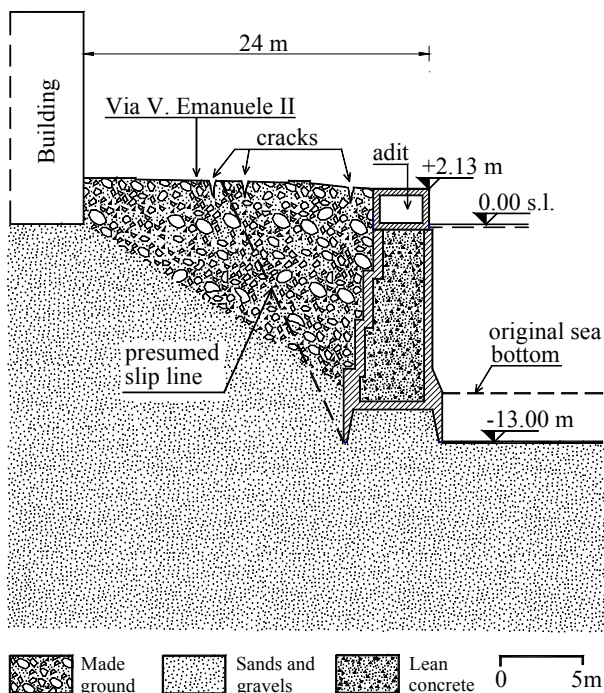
Schematic cross section A-A' of the quay wall, foundation soils and backfill material and backfill surface.
